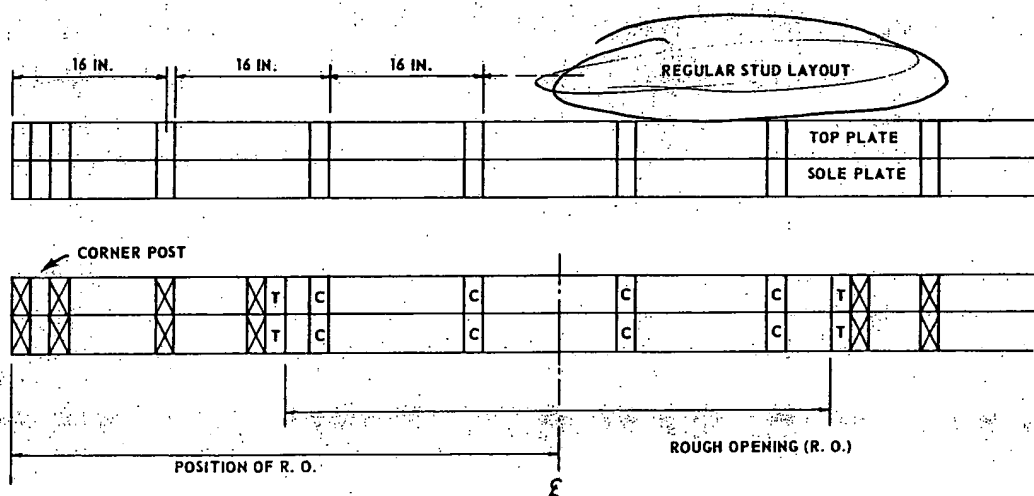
Layout of sole and top plates. Above, Regular stud spacing marked. Below, Converted for window opening.
